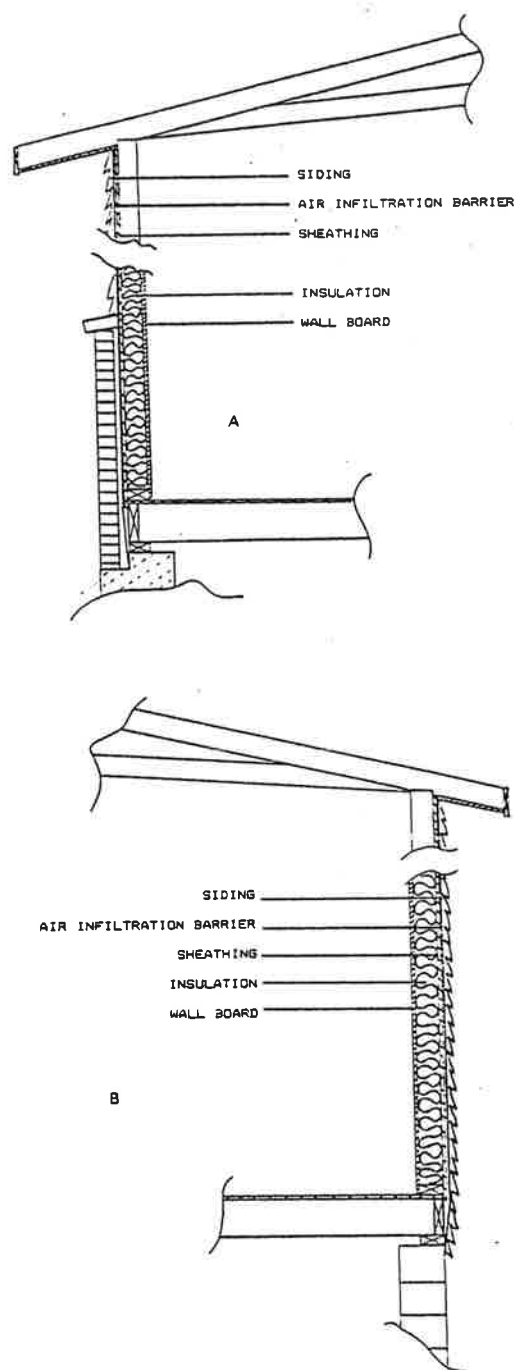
(A) Section at front wall of CCH; (B) Section at rear wall of CCH.
